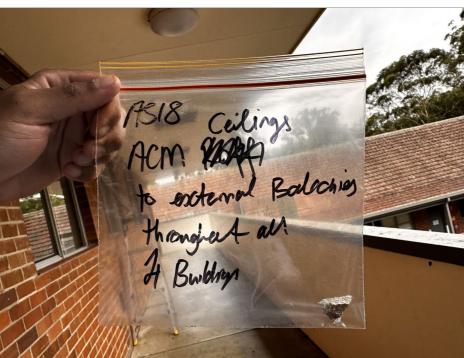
JVB and RVB – Sample 18 (S18): Sample of ceiling panels throughout balconies
